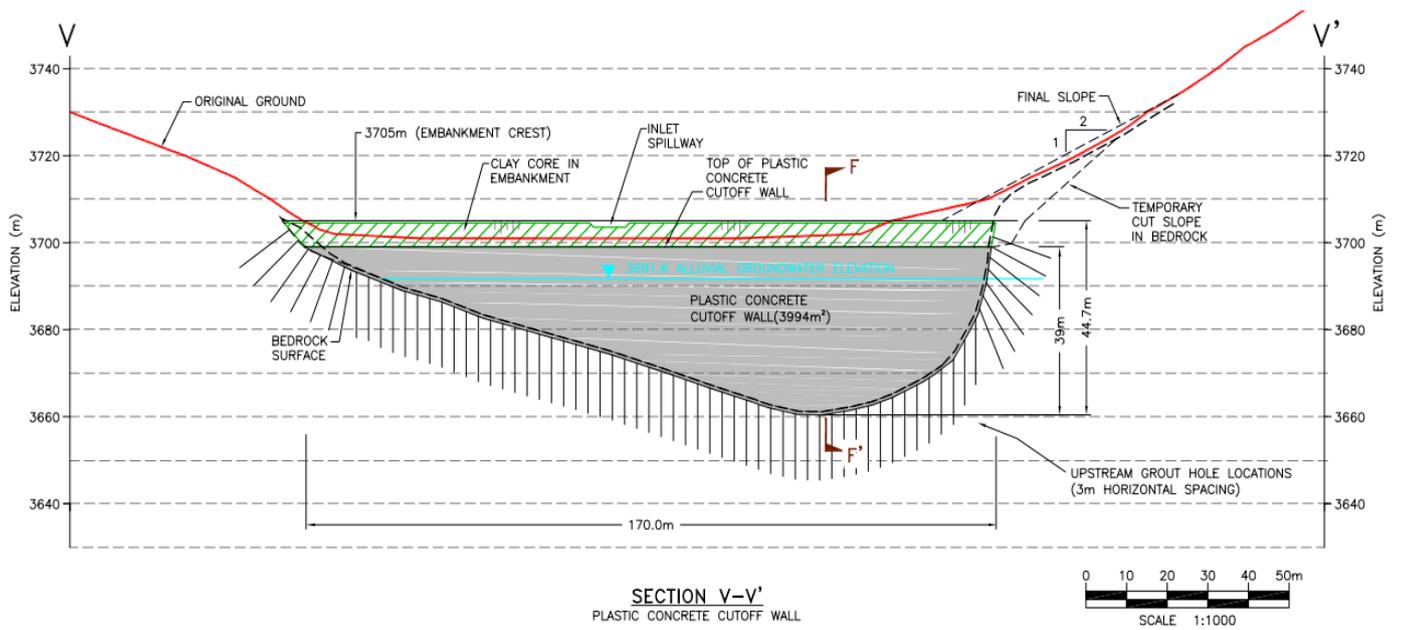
Example of plastic concrete slurry wall–grout curtain system in TSF dam.
